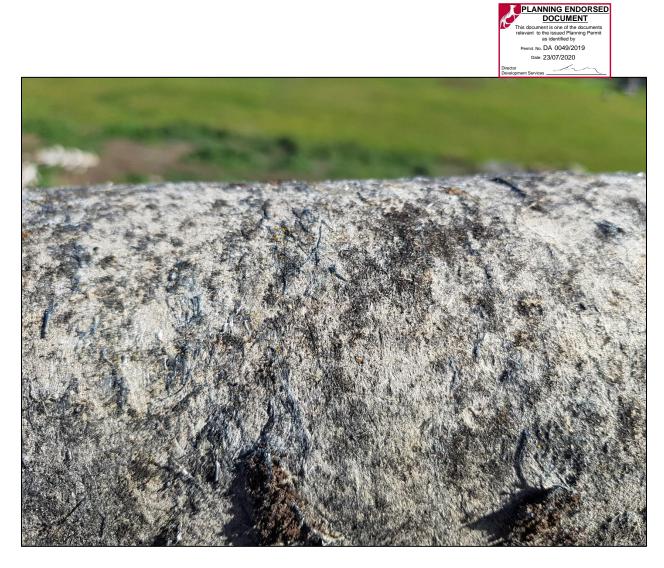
Asbestos Super Six Roof Ridge Cap at 45-47 Thistle Street West – Loose Asbestos Fibres
